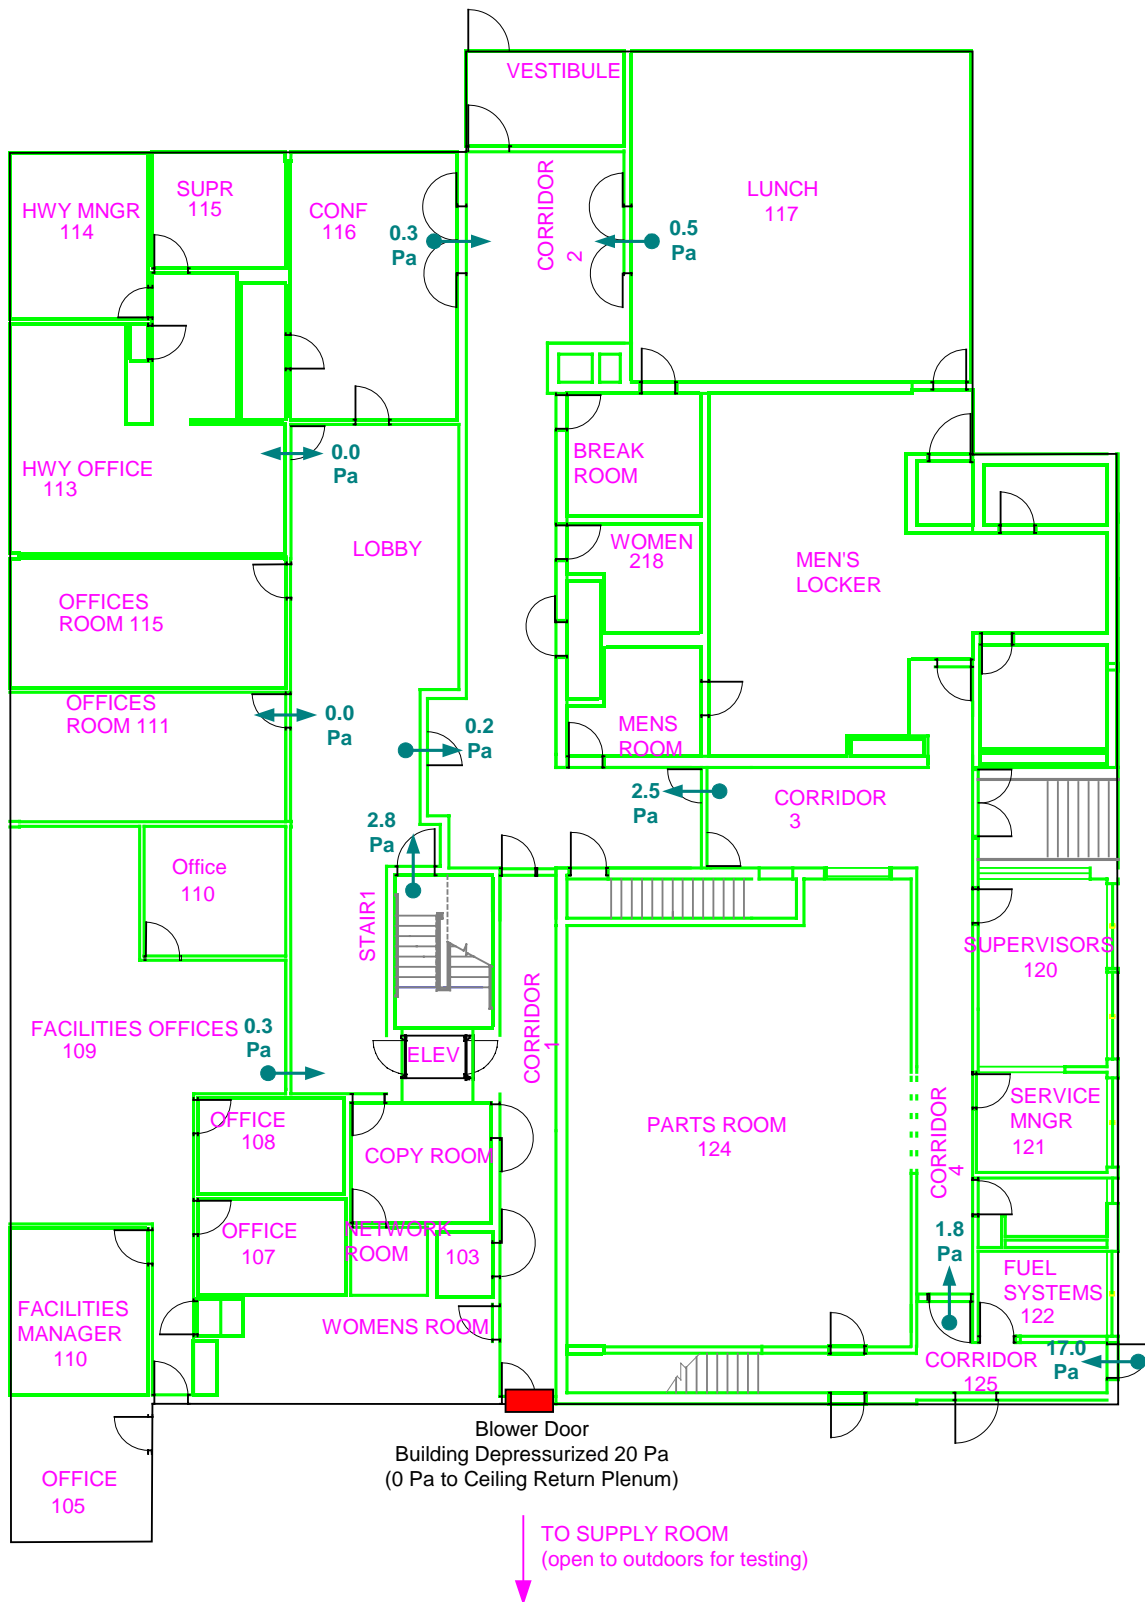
First Floor Room-to-Corridor Pressures with Building Depressurized to 20 Pa
